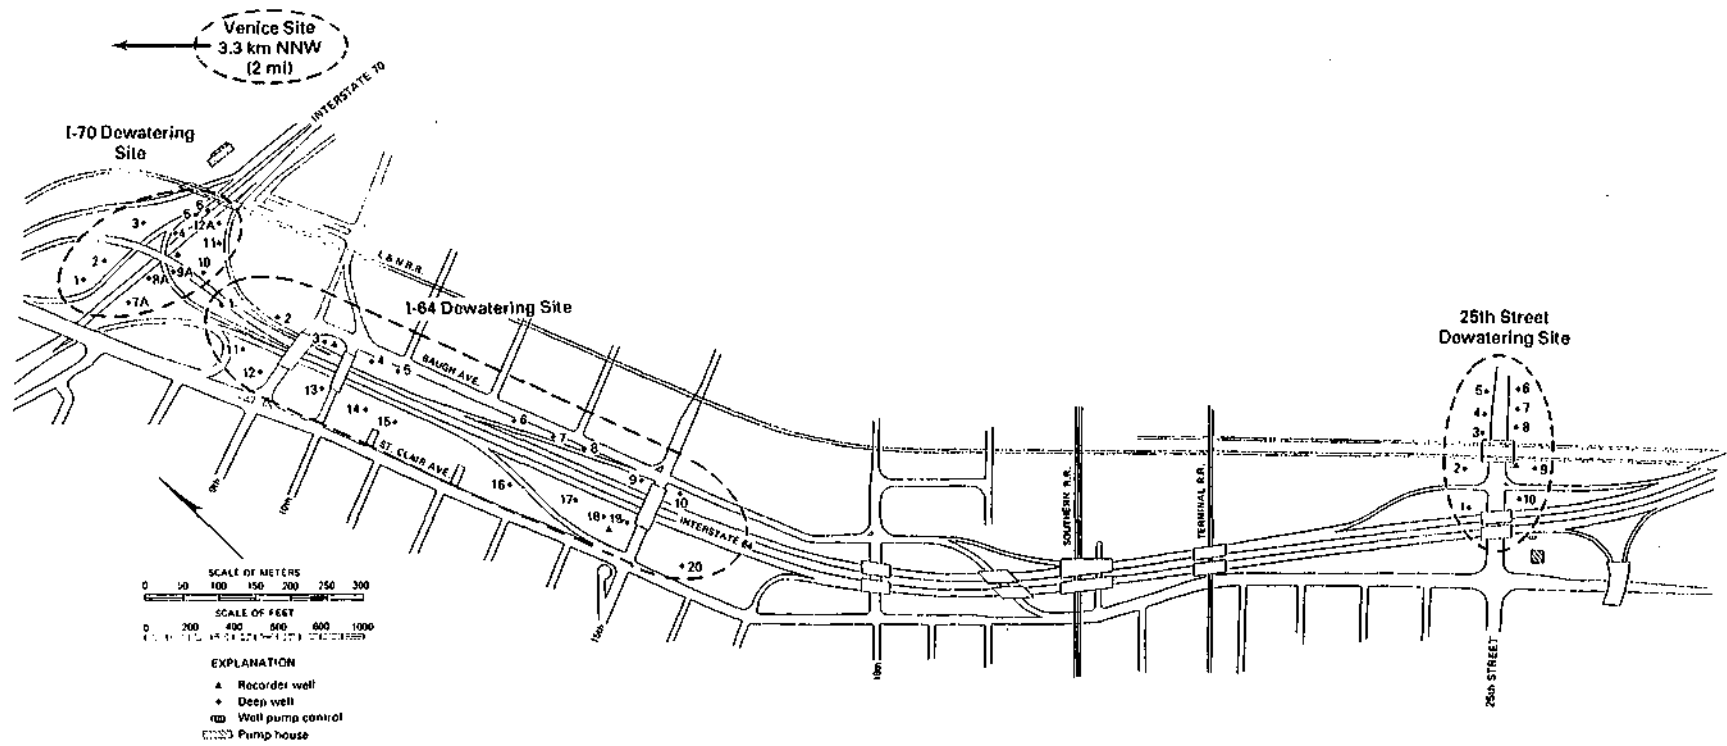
Locations of dewatering wells at the I-70 Tri-Level Bridge, I-64, and 25 Street
